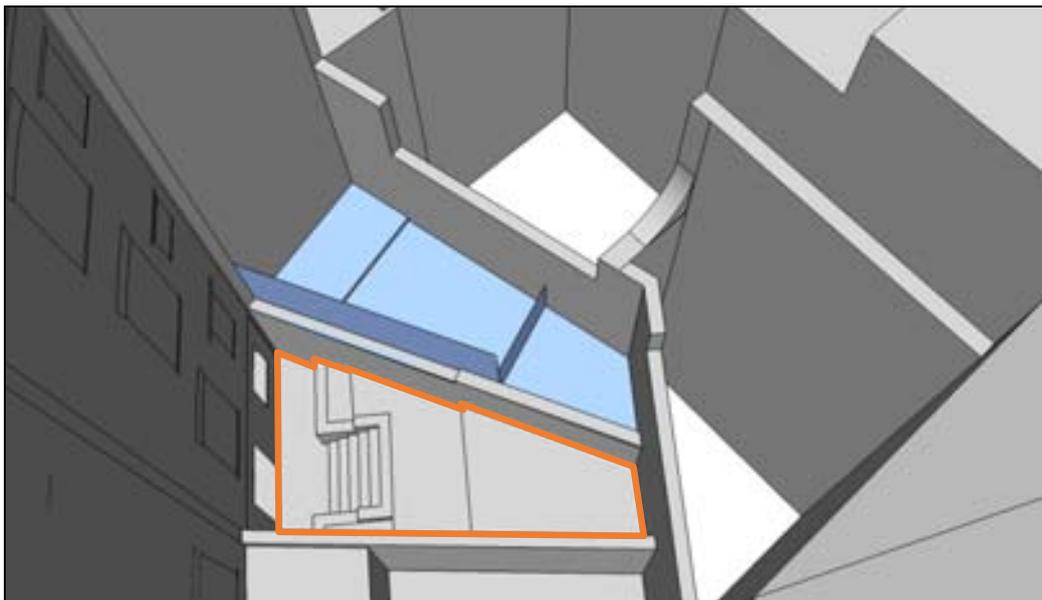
Location of amenity spaces (orange) neighbouring the proposed development (blue) at the rear elevation of No. 9 & No. 10 Sharples Hall Street
